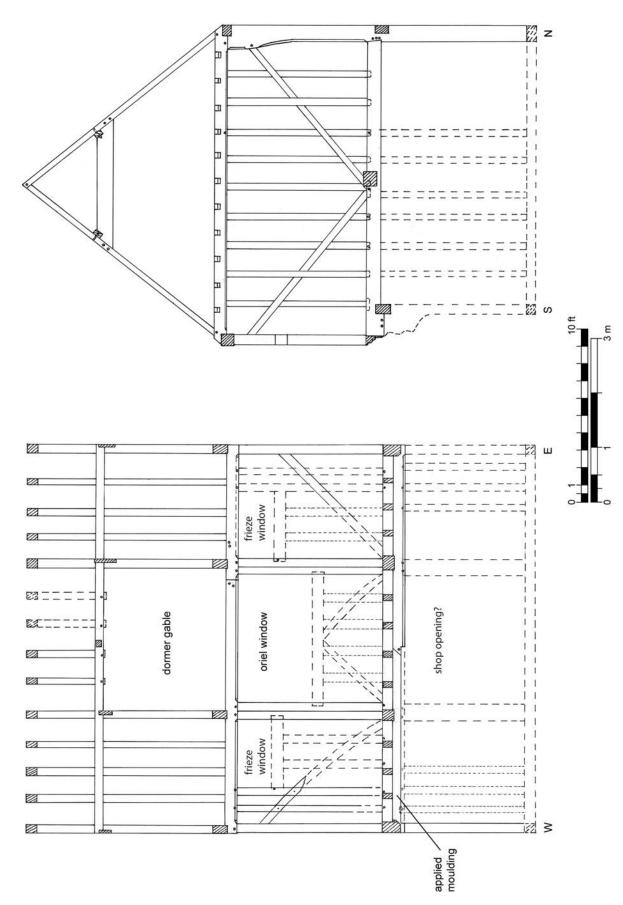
(left) South (front) and (right) east (side) elevations of The Bugle Horn, 30 Barrack Street (corpus no. 1). Drawn by Richard Shackle
